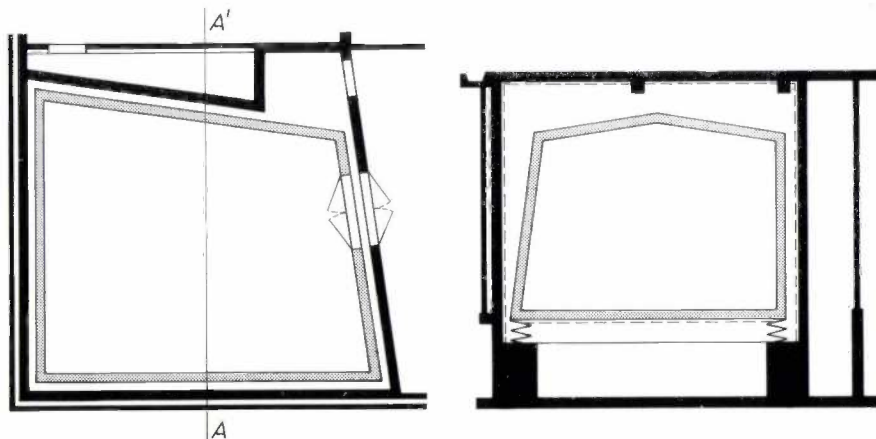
Plan of the reverberation chamber (*left*) and a vertical cross-section along the line AA' (*right*). The concrete wall of the reverberation chamber is shown grey; the sound-insulating brick walls of the enclosure are shown black. To prevent external vibrations from entering the chamber through the floor, the 150-tonne concrete chamber is mounted on 80 steel coil springs.
